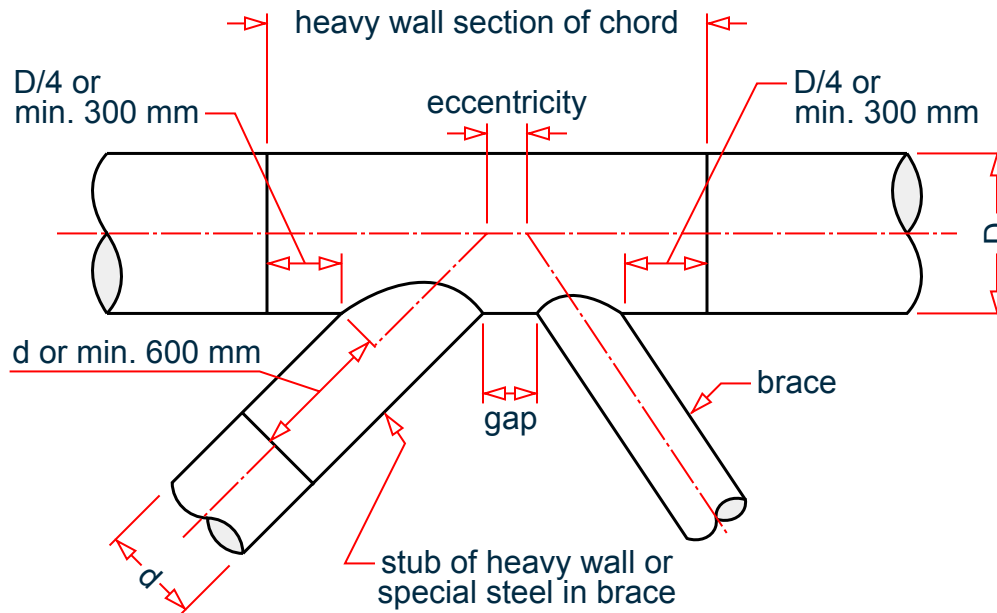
Typical Tubular Joint (Fig 6-1 in N004)
